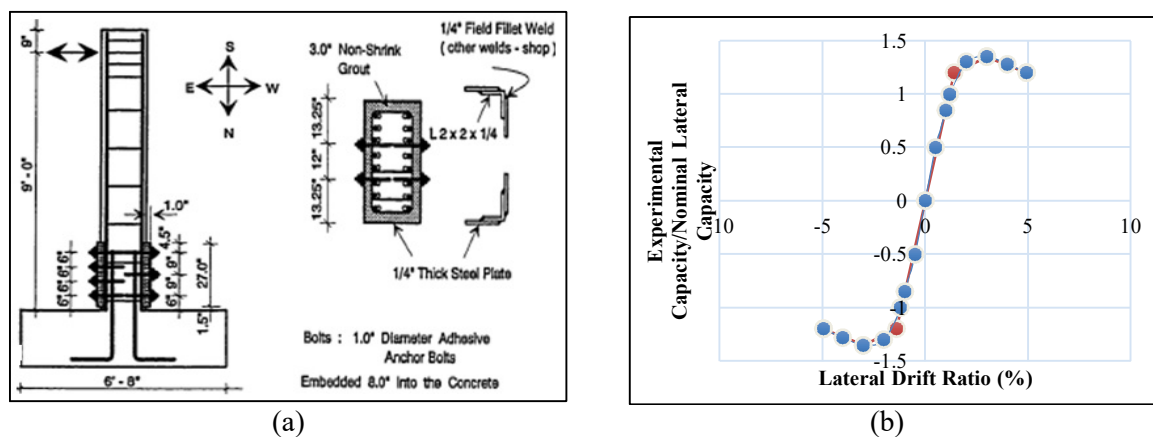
(a) Details of the Column and section with Steel Jackets and Anchors (Bolts [6] (b) Standardized force-strain curves for columns reinforced with Steel Jacket with Anchors [6].
